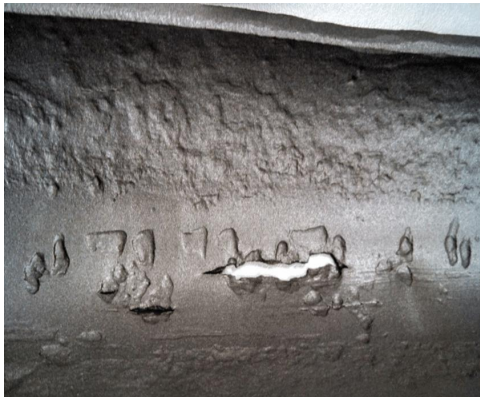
Pitting corrosion on Steel Pipes
